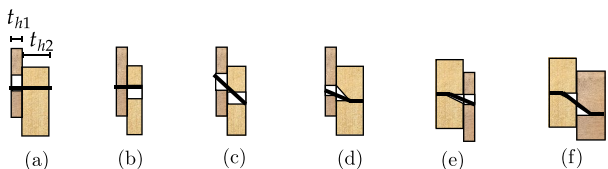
Possible failure modes a–f for a fastener loaded in single shear plane
